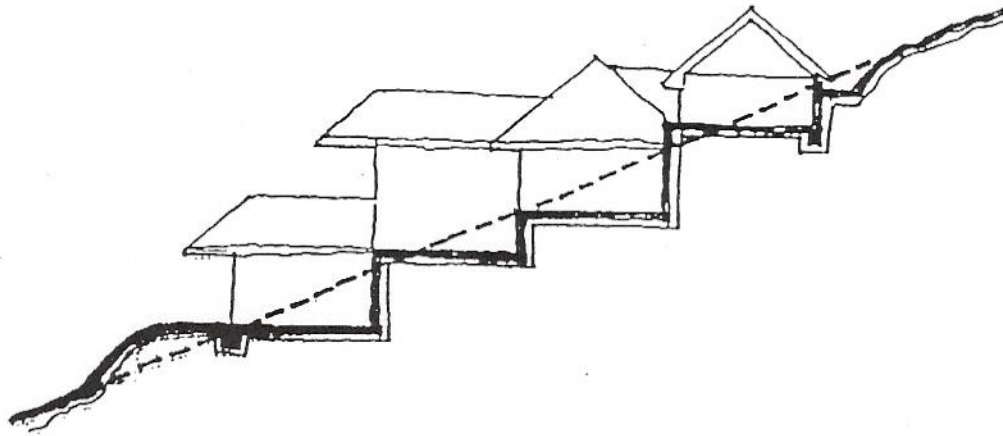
Building height regulations encourage buildings to follow the natural slope of a lot.
